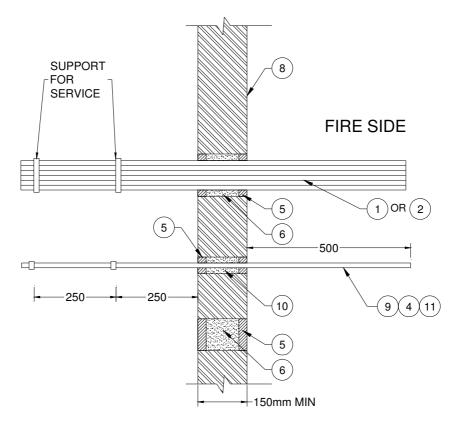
Typical Details for Cables wrapped with Emat for Masonry Walls
